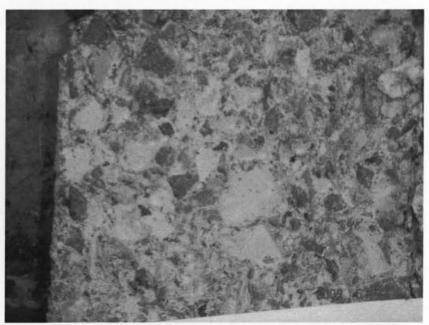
Crushed Limestone Specimen without Shingles after Indirect Tensile Test
